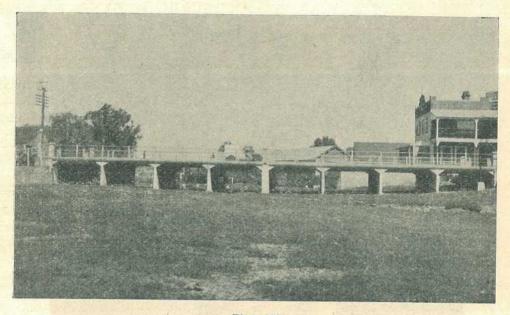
Bridge over Bradley's Gully on the Charleville-Adavale Road at Charleville. This modern reinforced concrete slab bridge replaced an old timber structure.
